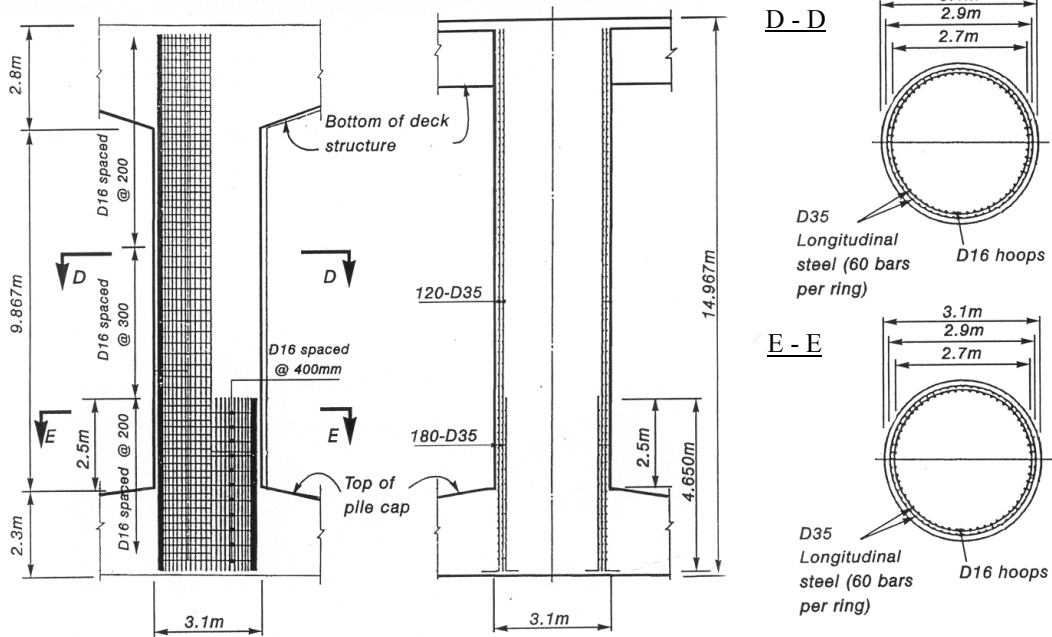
Longitudinal and transverse reinforcement of typical collapsed pier
